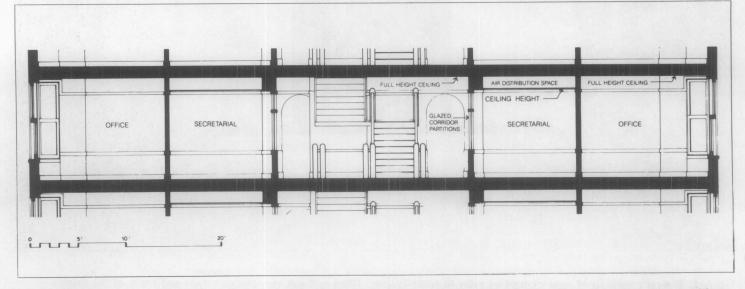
Building cross section showing open stairs and full height ceilings in corridors and private offices. Glazed corridor partitions are feather-chipped glass. Drawing: Montauk Company
